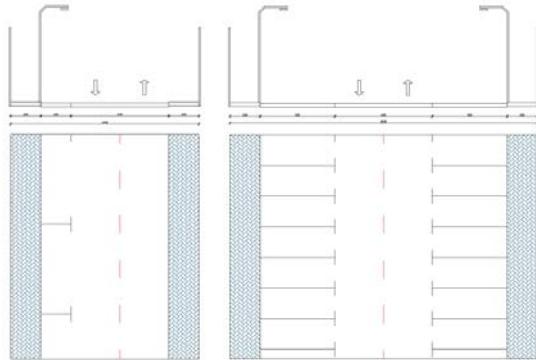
Geometric cross sections of streets Planirana 4 (left) and Planirana 6 (right)
